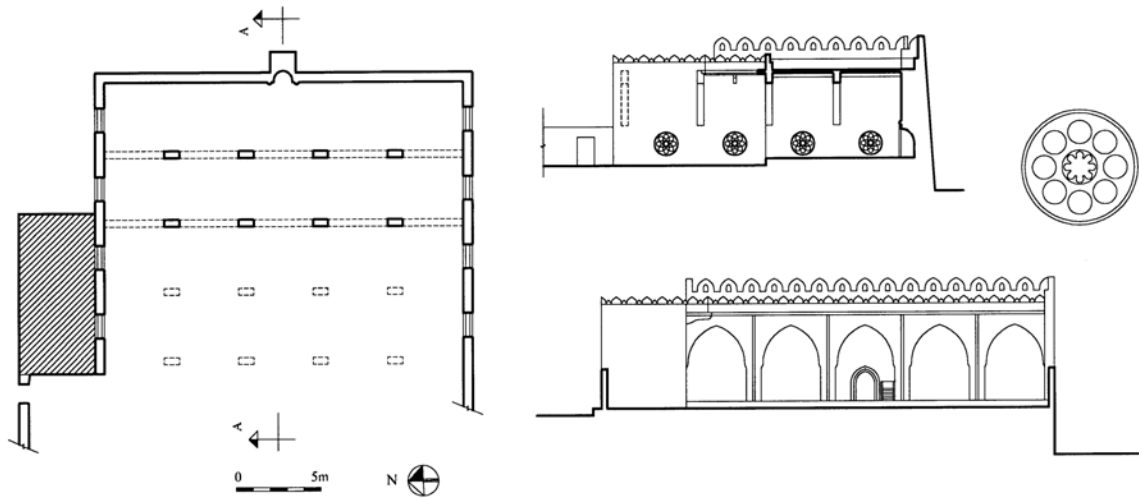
Caravan (Karwan) mosque (no. 49), plan, longitudinal section, east elevation of the prayer hall and details of one of the pierced stone round windows. The impost of one of the arches of the lost bays can be seen on the southern wall in the section.
